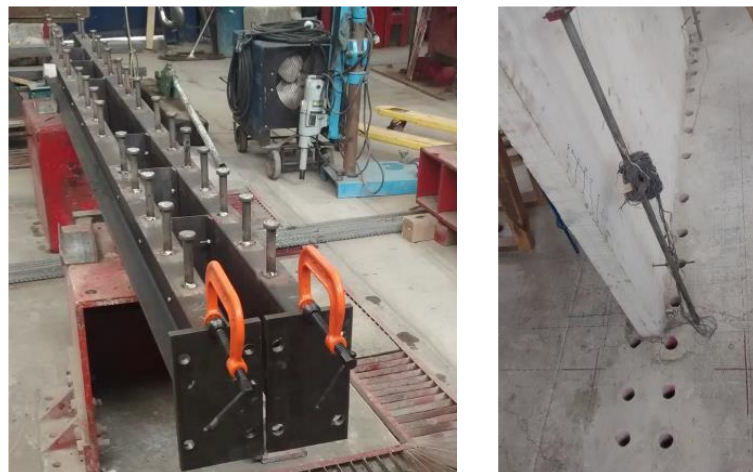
C shaped steel channel with stud shear connectors (left), drills in the concrete slab
